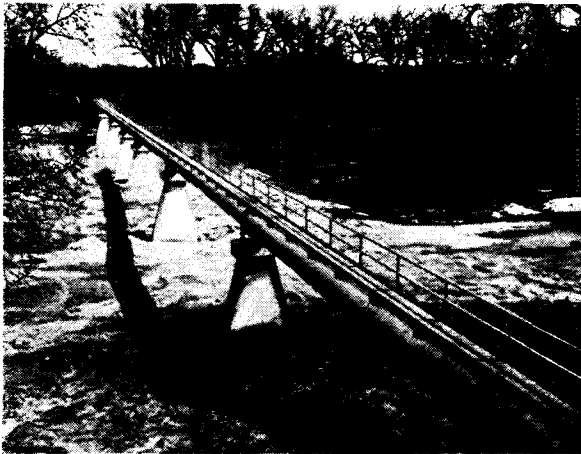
Welded steel pipe flume. P-271-701-3855
